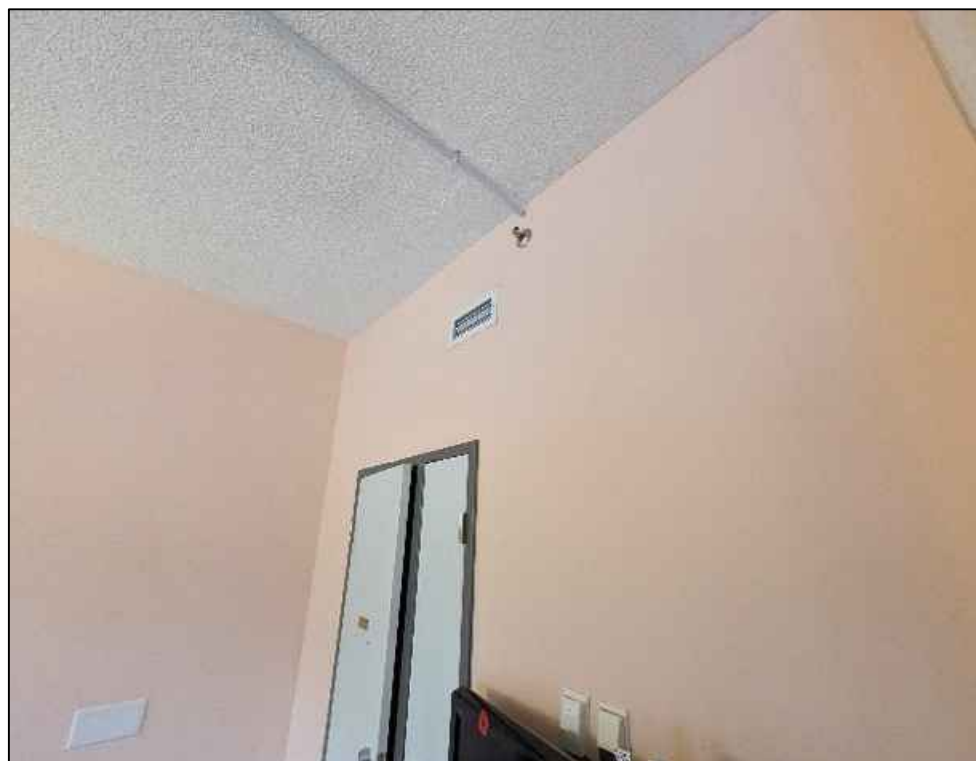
PHOTOS ALSO INDICATE THE GENERAL LAYOUT OF THE ROOM INDICATING THE EXTENT OF DRY WALLS AND CEILINGS THAT NEED TO BE PROVIDED WITH ACCESS OPENINGS TO INSTALL NEW WIRING.
